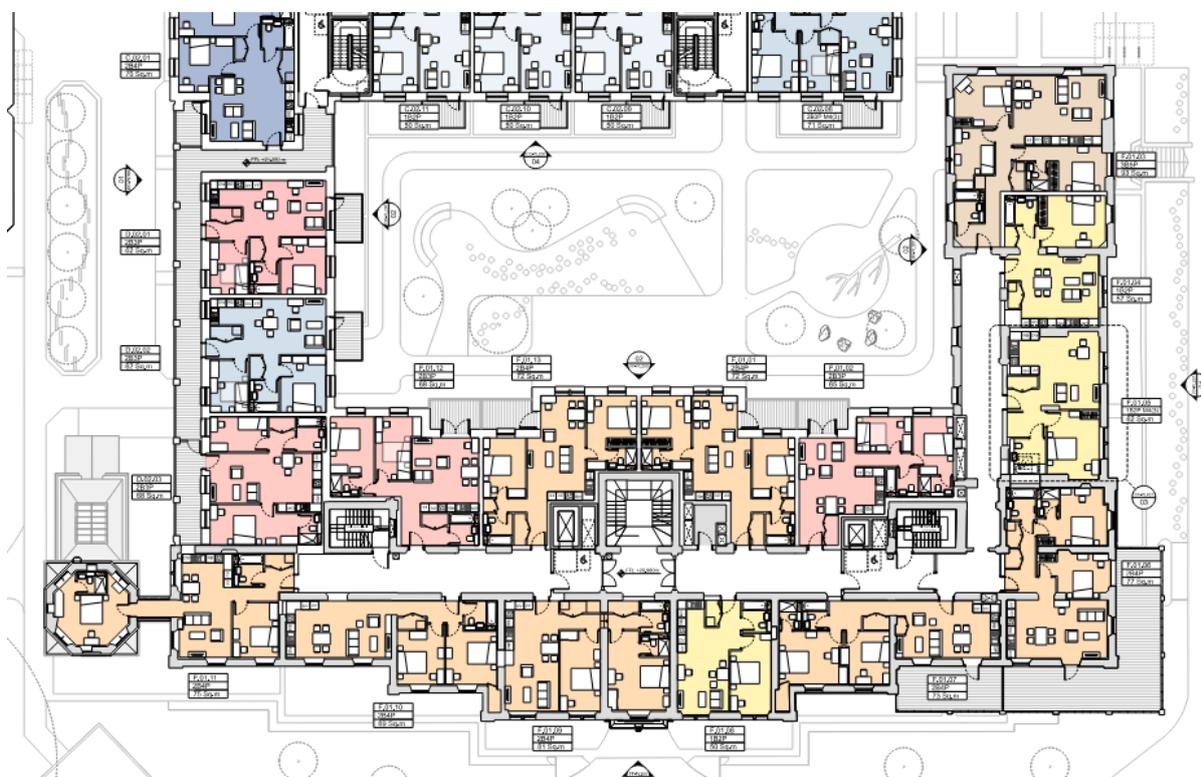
Proposed upper floor plan of Block F demonstrating retention of majority of historic plan form within the listed element
